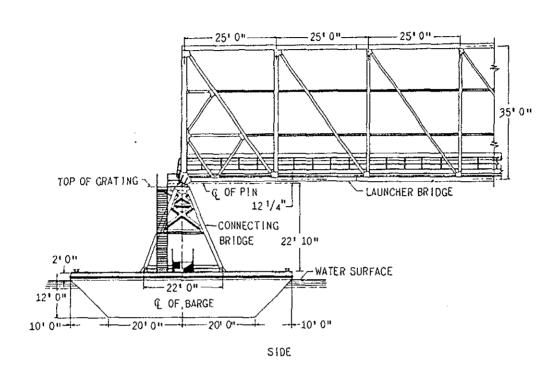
Launching Bridge Elevations with Controlling Dimensions.
